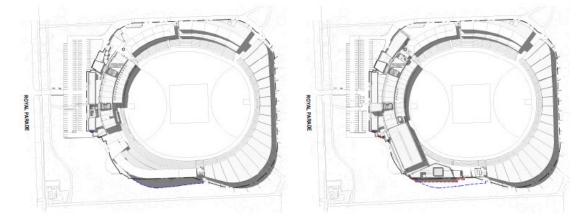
Existing and proposed shadows at 2.00pm at equinox (source: application plans prepared by Populous)
